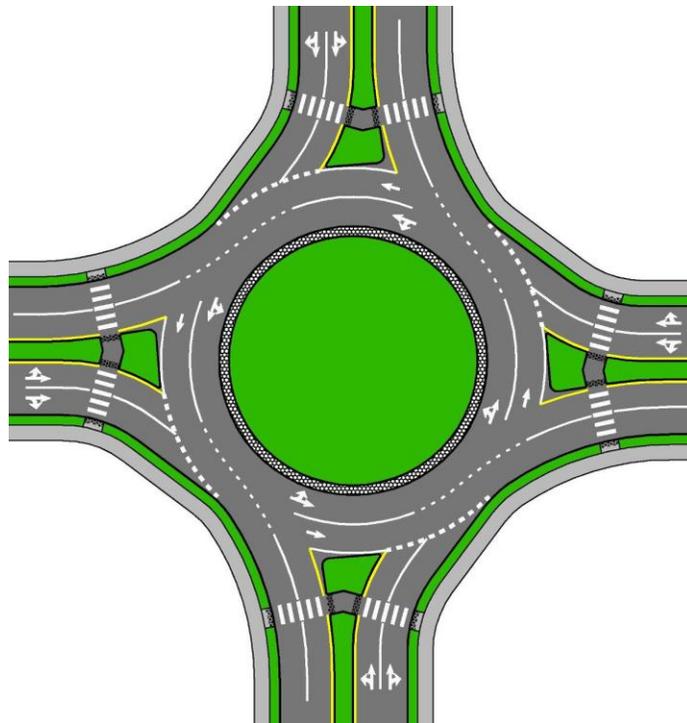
Lane Arrangements for Typical Double-Lane Roundabout
